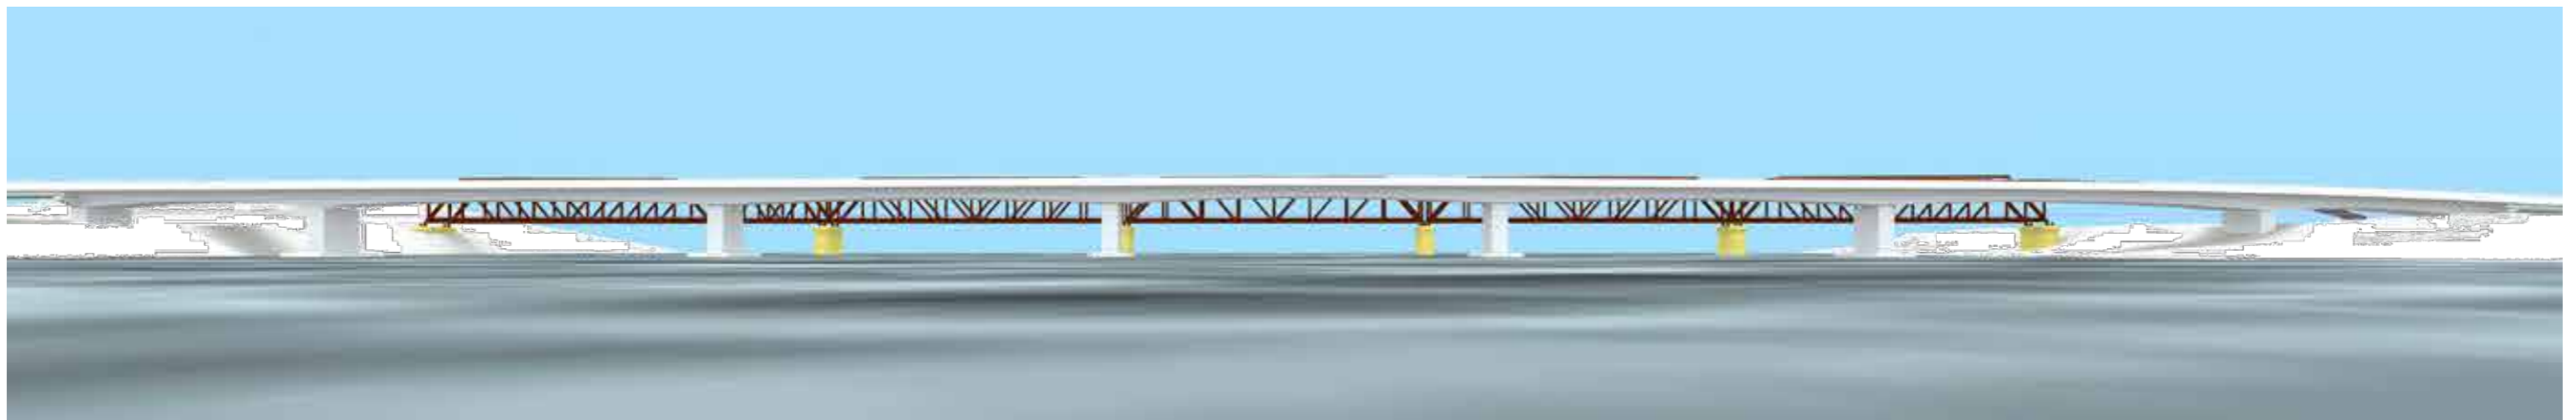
View of proposed Grafton Bridge from the Clarence River
